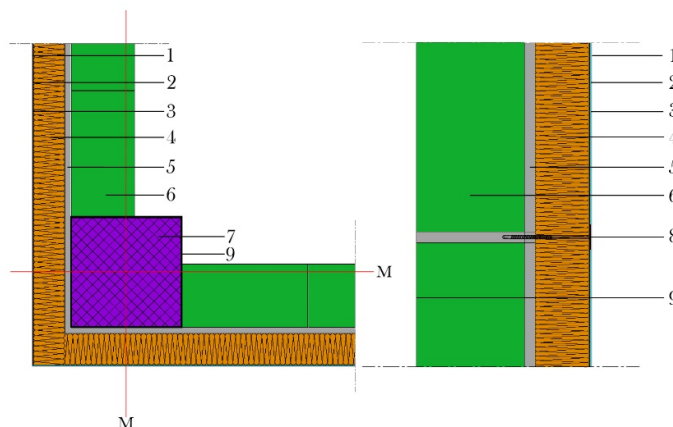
Vertical and horizontal section of an exterior façade wall using Adingterm panels¹
